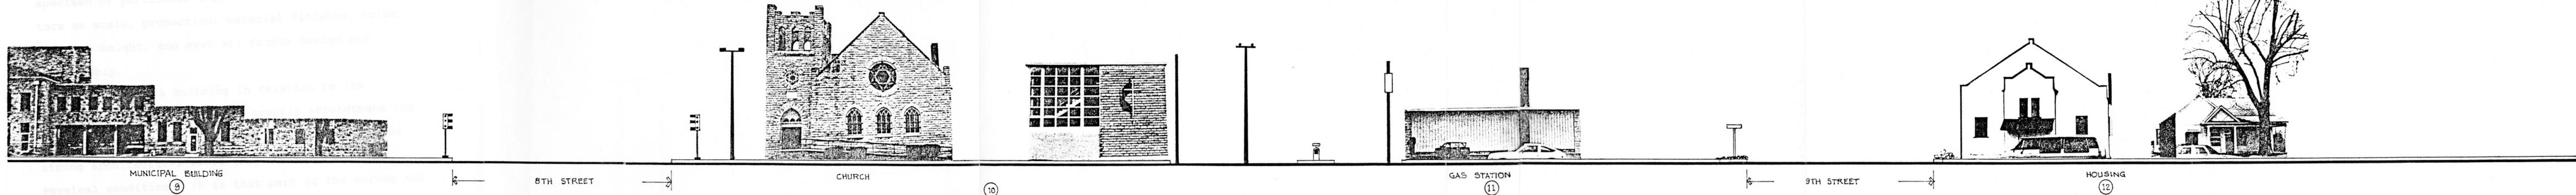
WEST ELEVATION FROM JEFFERSON STREET
